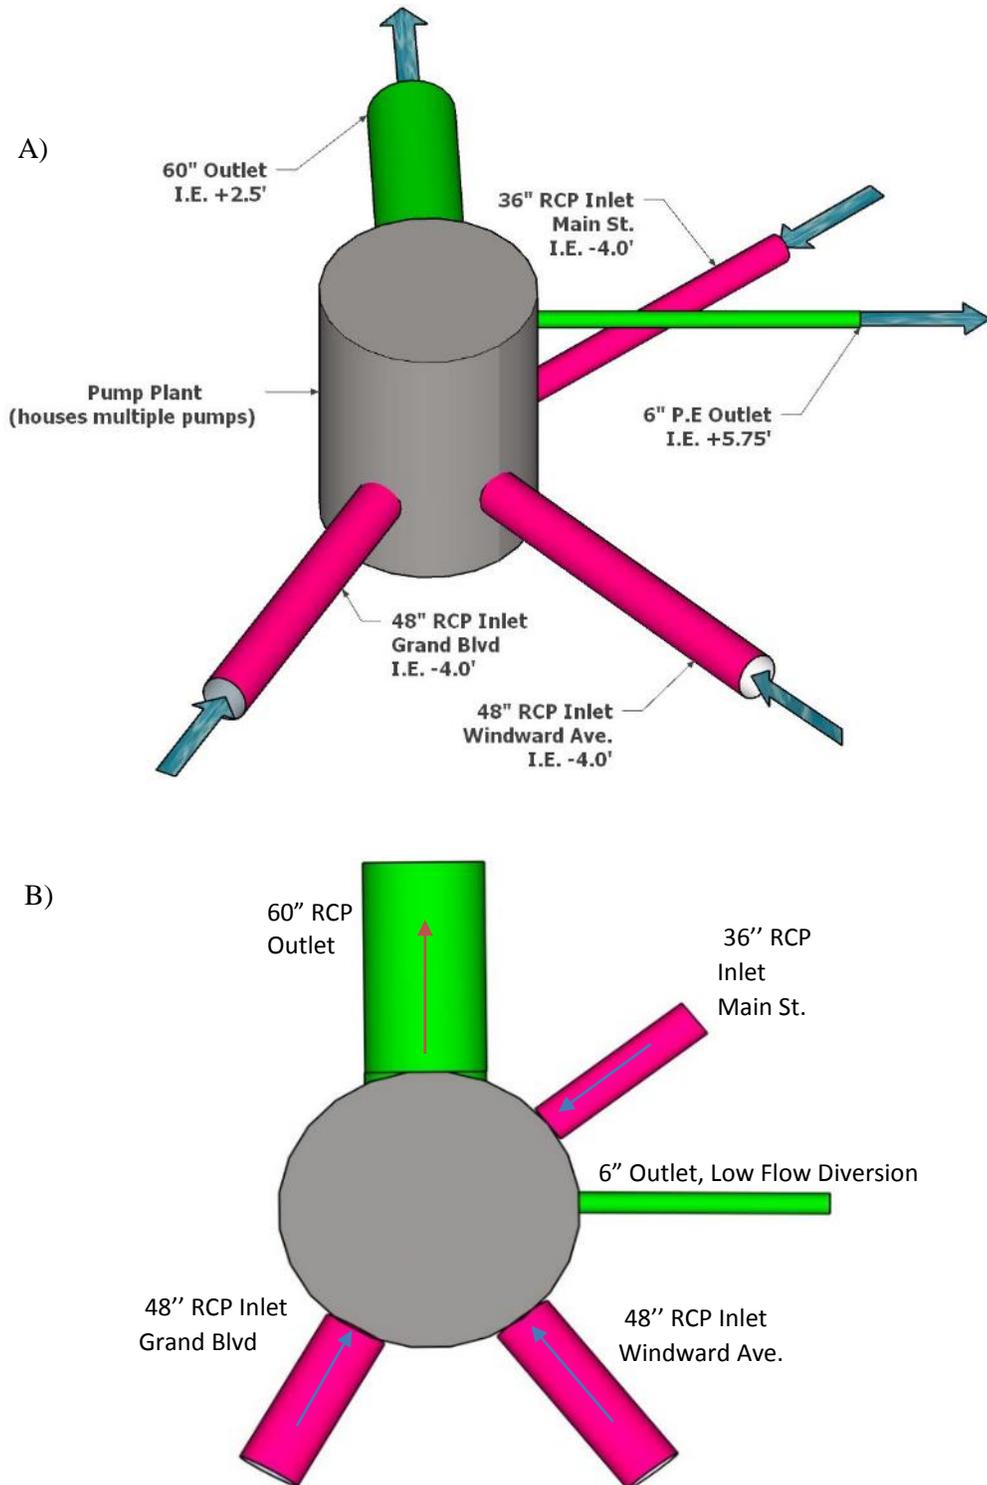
A) Isometric Configuration of Pump Plant 647. B) Plan Configuration of Pump Plant 647.
